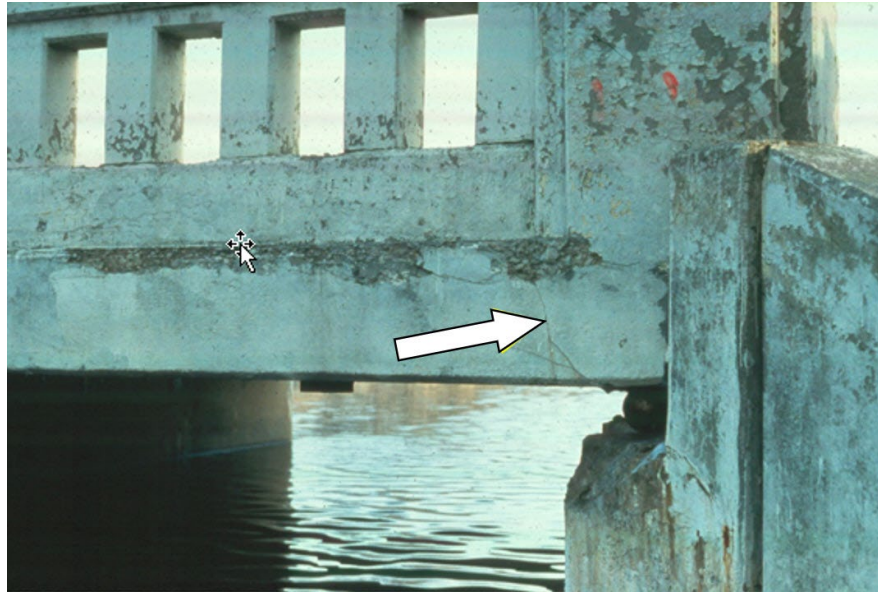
Diagonal Shear Cracks Close to the Ends of a Slab Bridge
